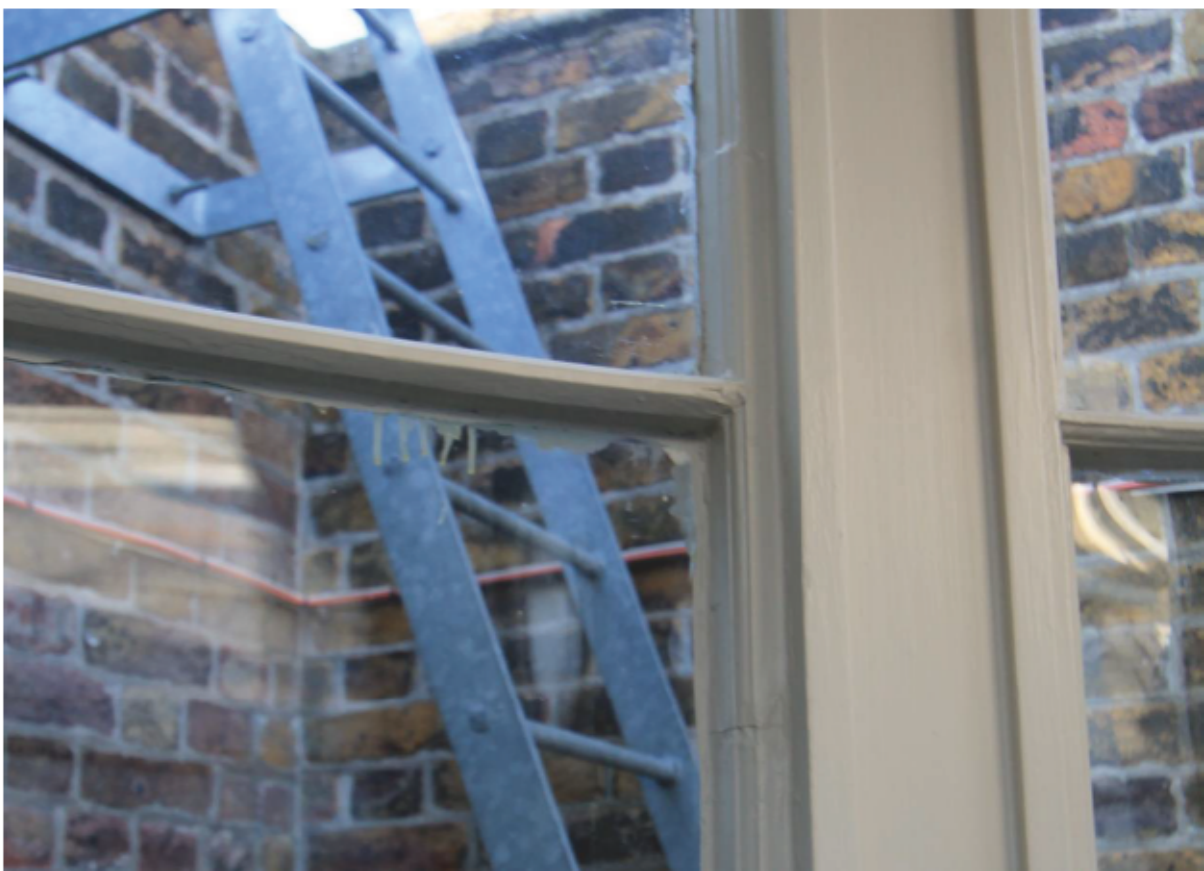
Lantern A: Internal Repair 1 showing plain glazing bar
